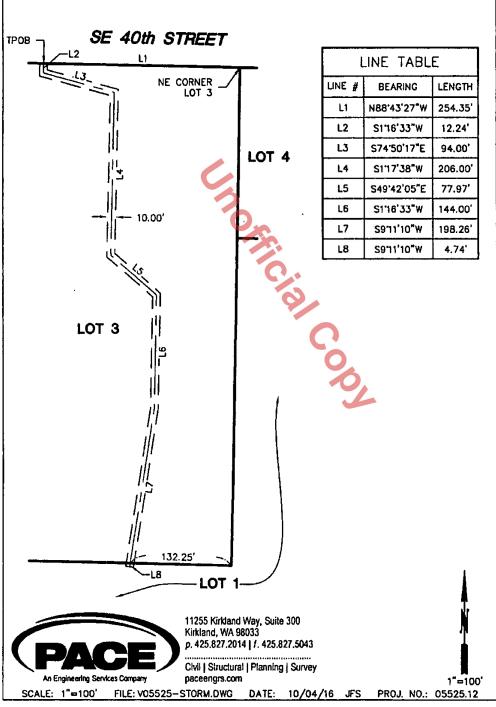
EXHIBIT B EASEMENT AREA EXHIBIT (DRAWING)
